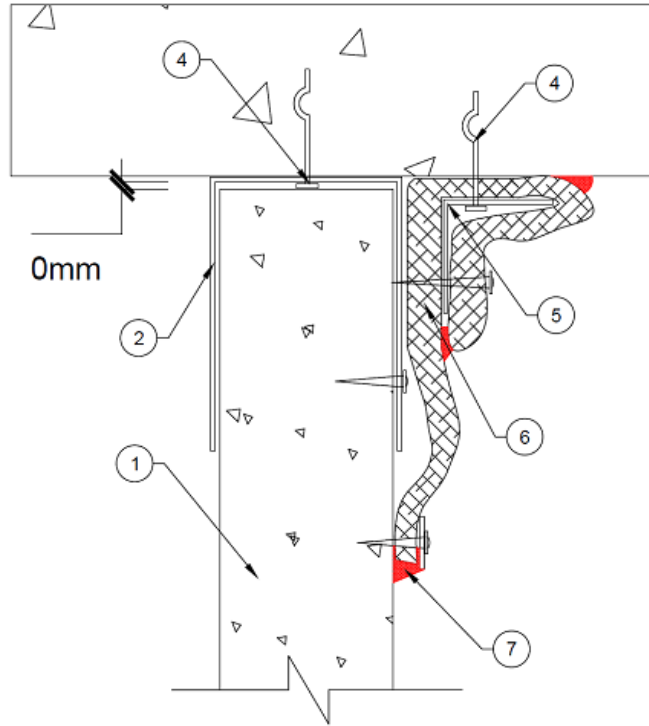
Head Detail 1 of the Wall with Minimum Gap Size
